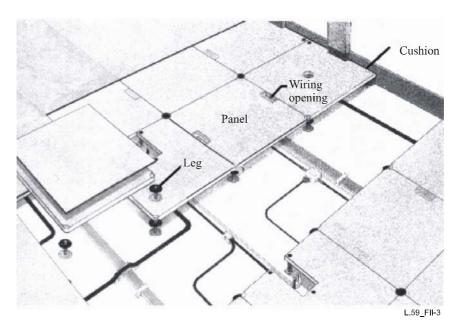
/L.59 – Example of simplified access floor system (Panel-leg separate type)
